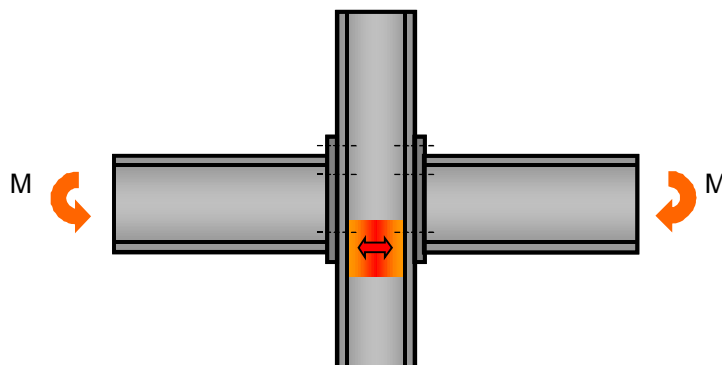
Extended end-plate joint showing the column web component (shaded).
